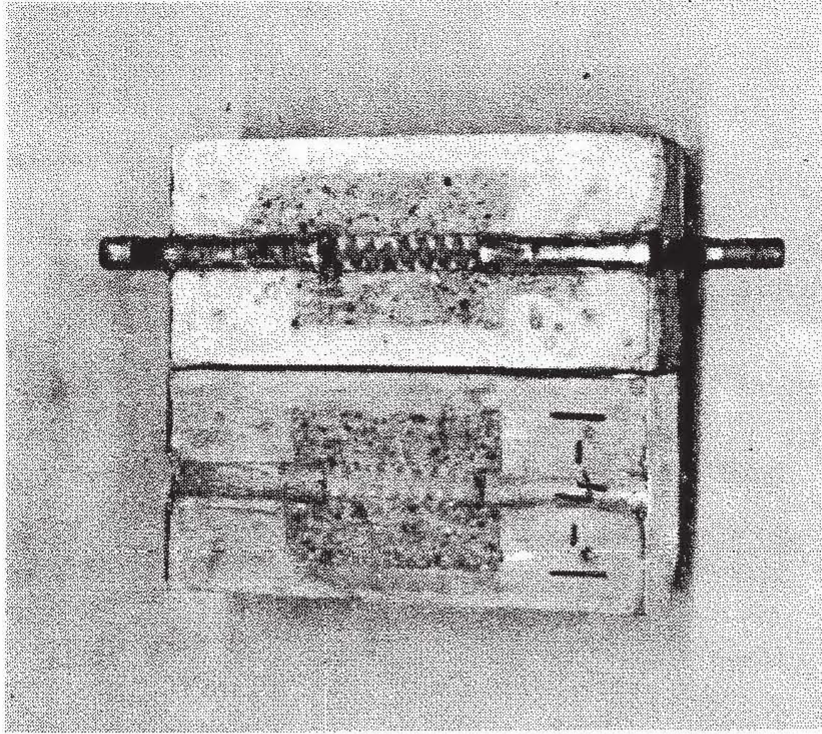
PHOTO OF A SPECIMEN FROM SERIES 1.4. FAILURE BY SPLITTING.
